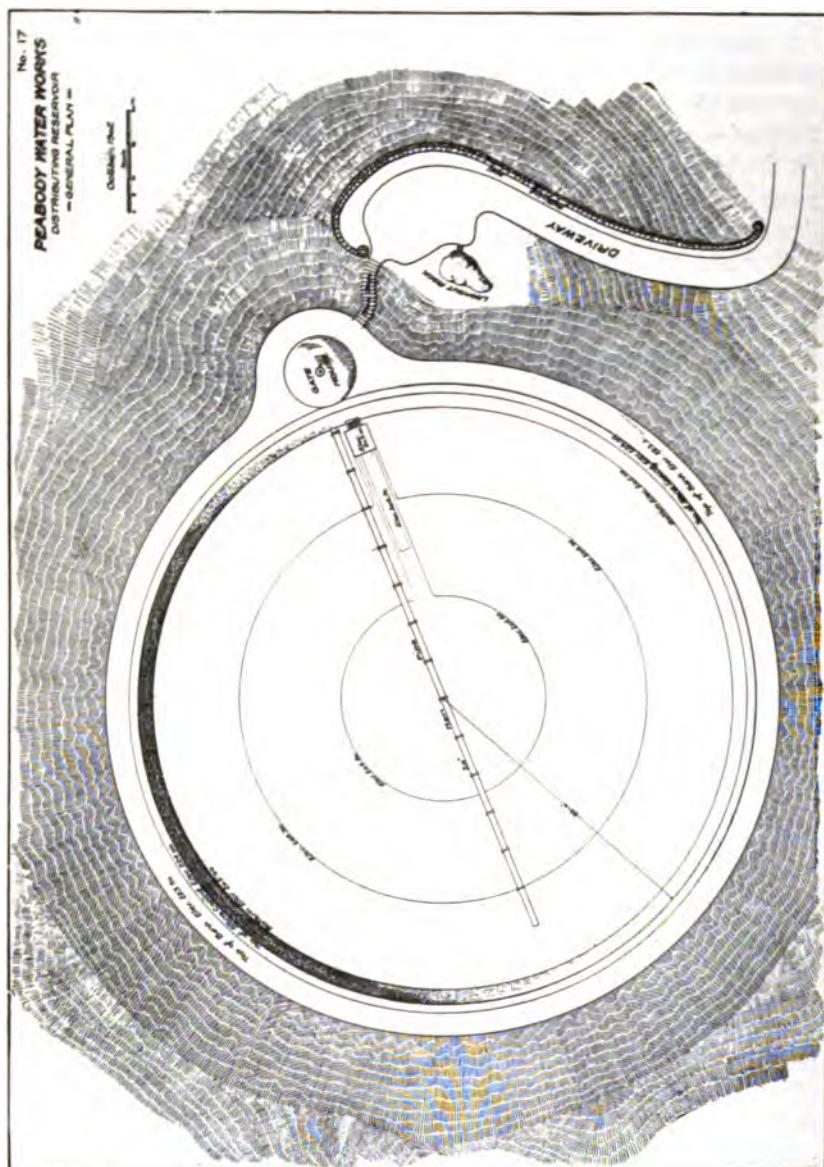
GENERAL PLAN OF COMPLETED RESERVOIR.
